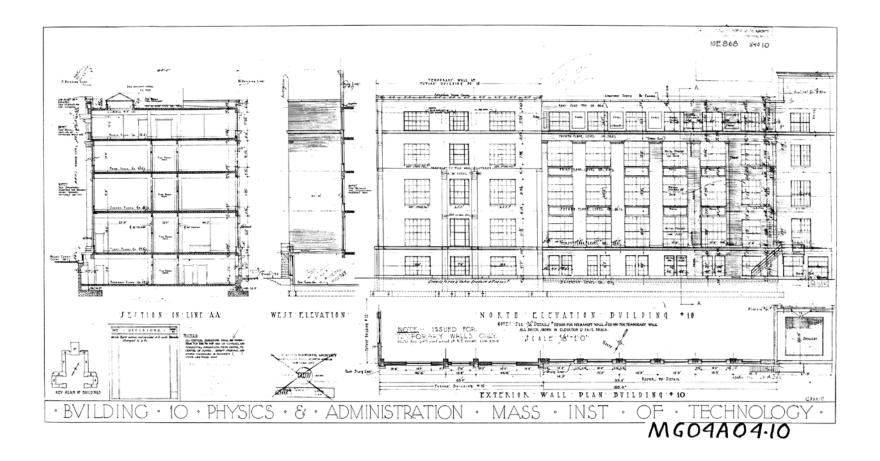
Facade facing the North backyard. The hatched area is dressed with brick.
